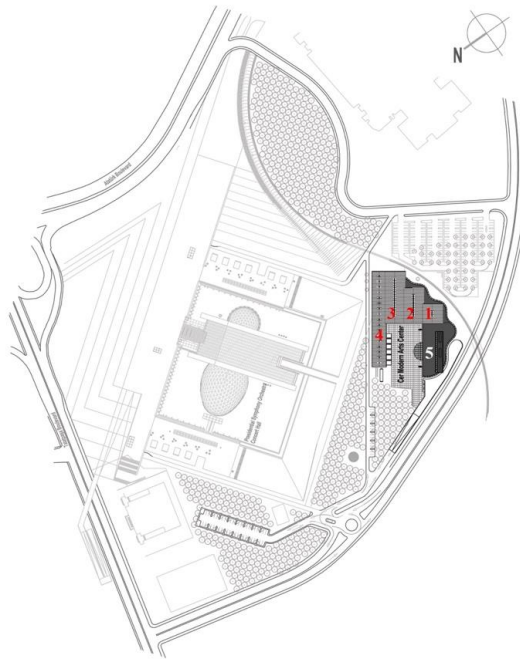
CerModern site plan (Uygur Architecture Archive, 2019)
